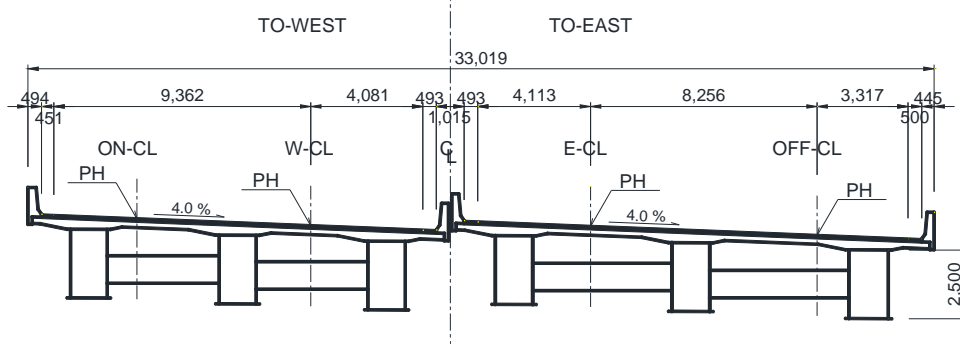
(2) Typical Cross Section of Widening Bridge Section
